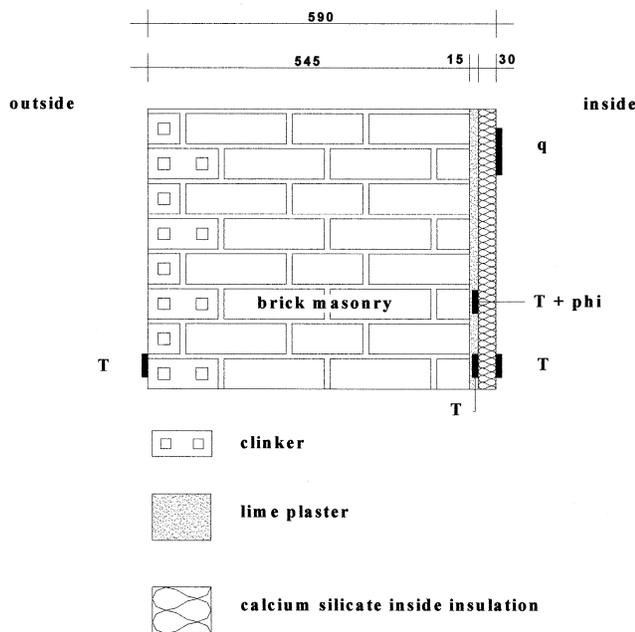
Outside wall in the first floor with arrangement of the measurement sensors.
